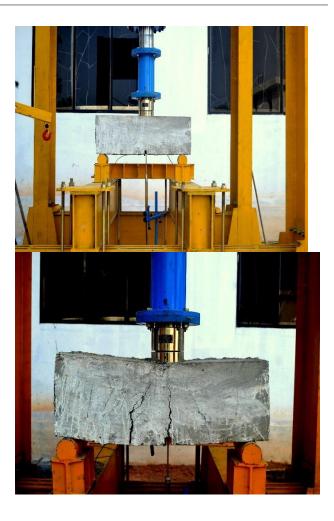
Fracture test set up of notched beam Fig 13 Crack appearing on notched beam
